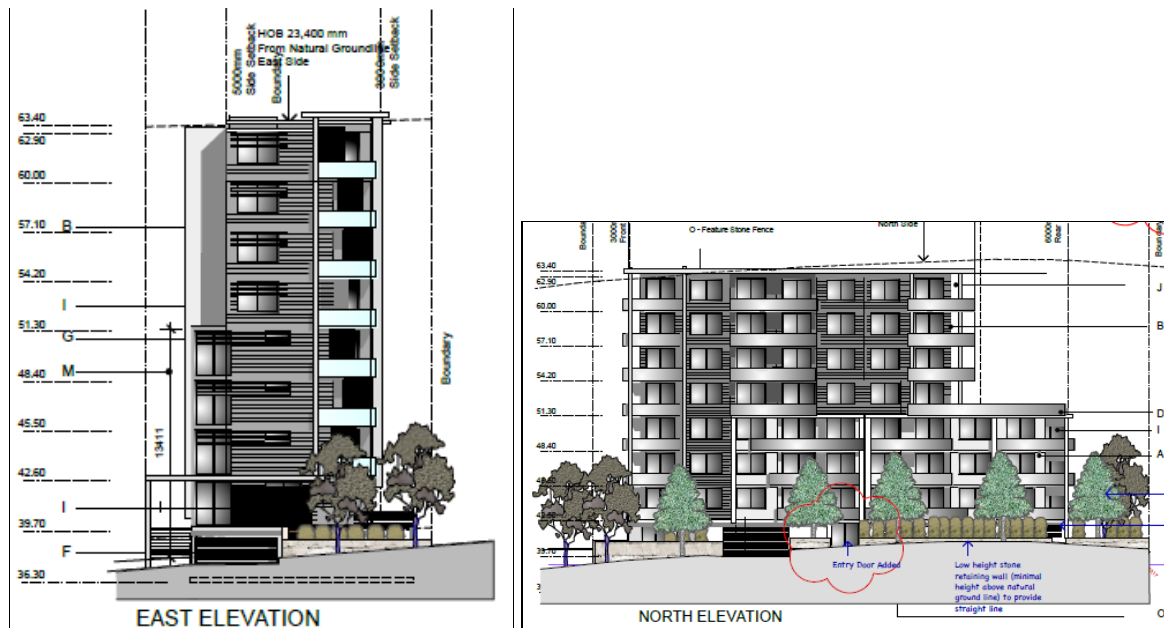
North and East Elevations of the approved development at No. 226 Gertrude Street
